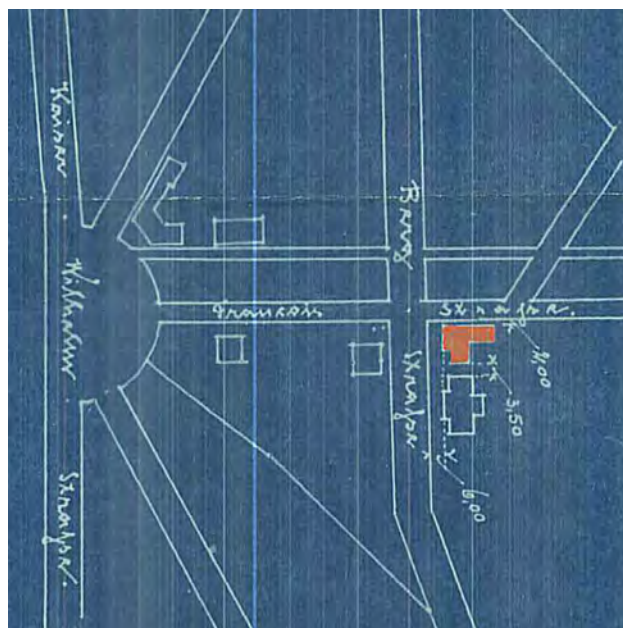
House m Site Plan, July 1909. BAU 37/B/43: Haus M.
